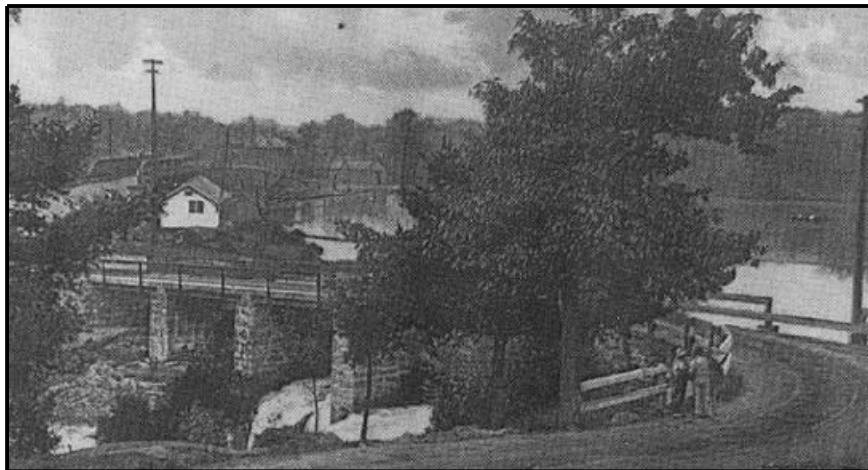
1913 bridge and dam with unknown house on Burgess Island beside railway tracks. *Source: Petry, Bala
